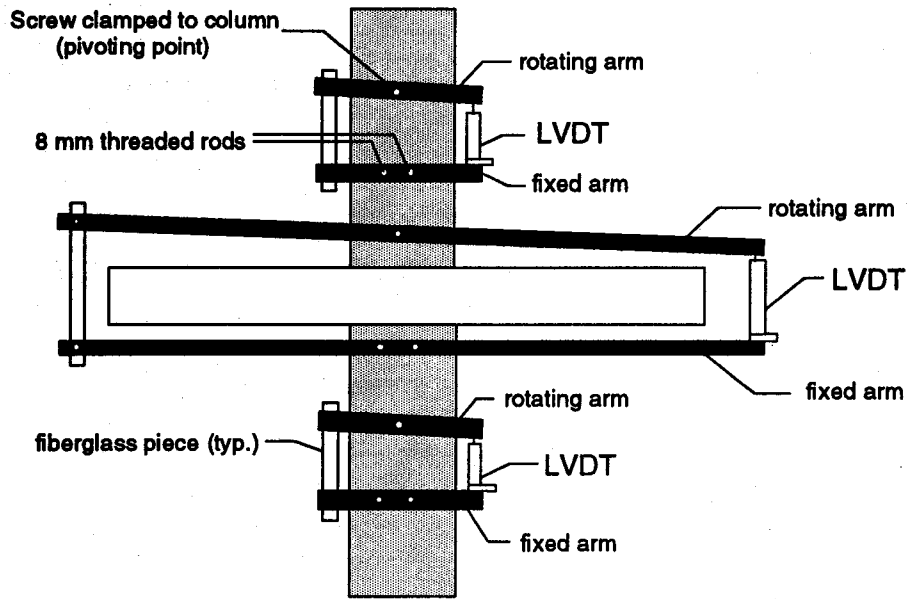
LVDT Set-up for Series B Rectangular Column Specimens
